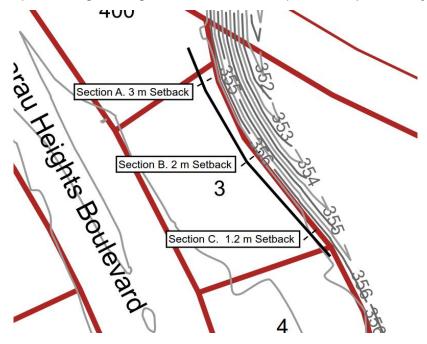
Site Plan showing set-backs for Sections A, B and C.
